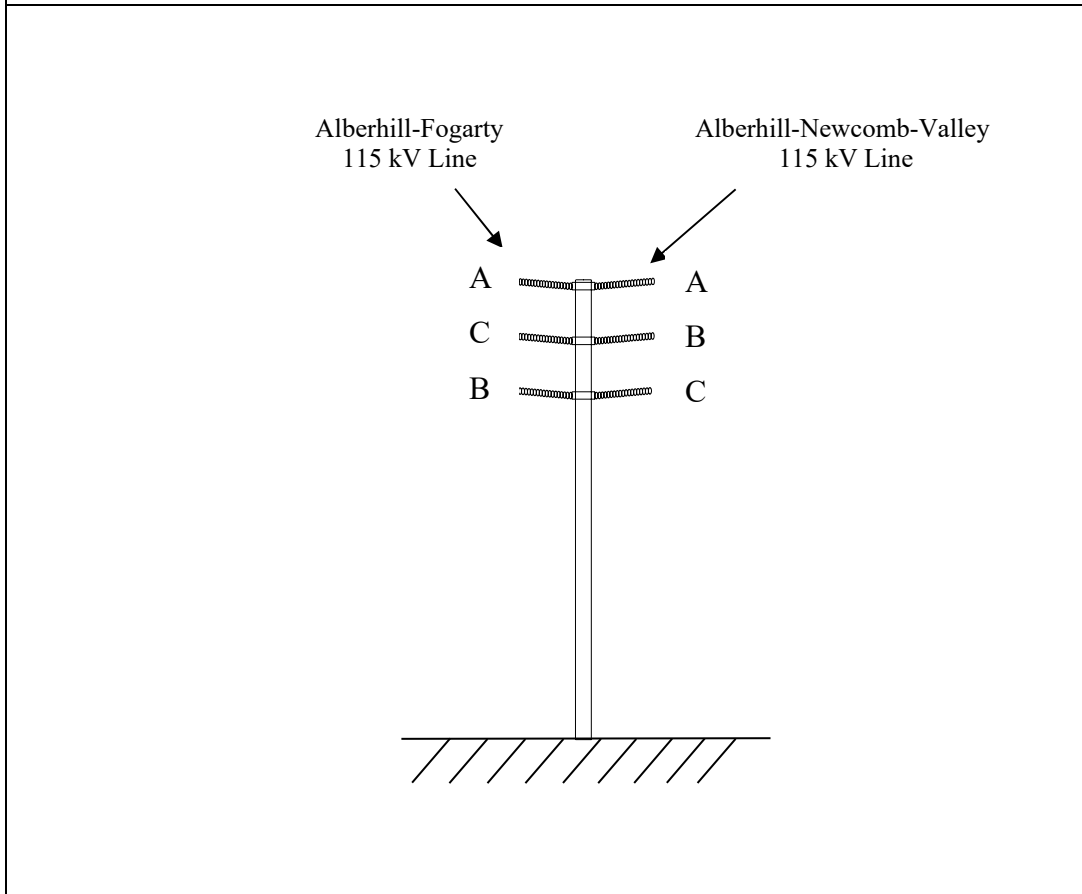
Existing 115 kV Design - Section 1 (Looking Southeast)
